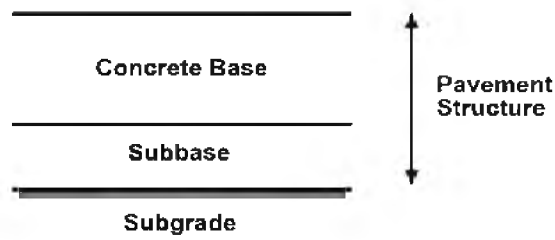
Typical Rigid Pavement Structure (Austroads 2009)
